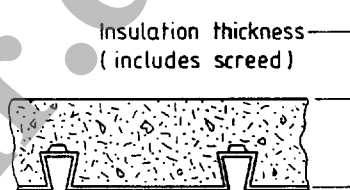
Insulation thickness for re-entrant profiled steel sheets
